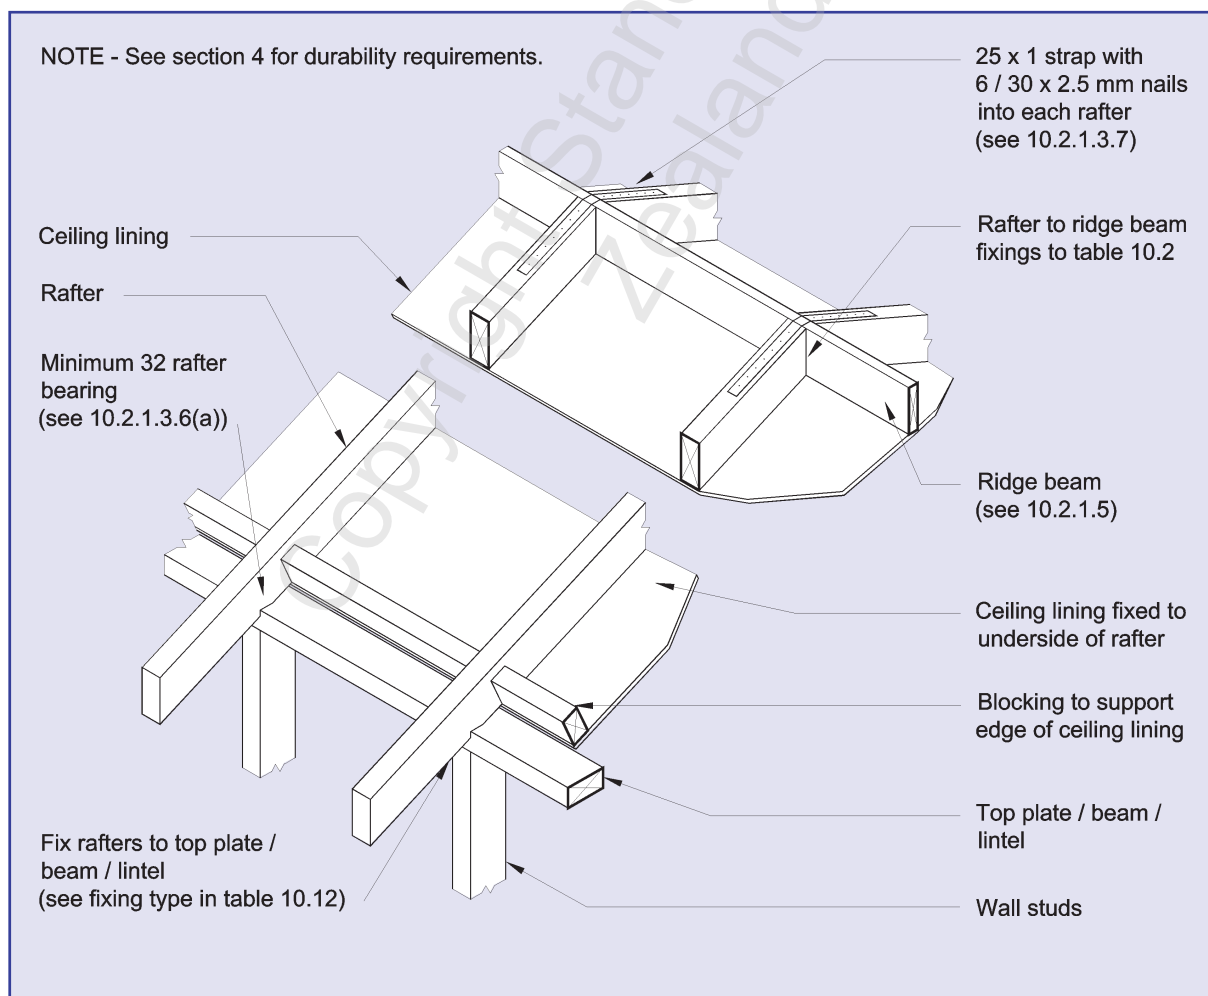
Fixing rafters – Skillion roof (see 10.2.1.3.7)
